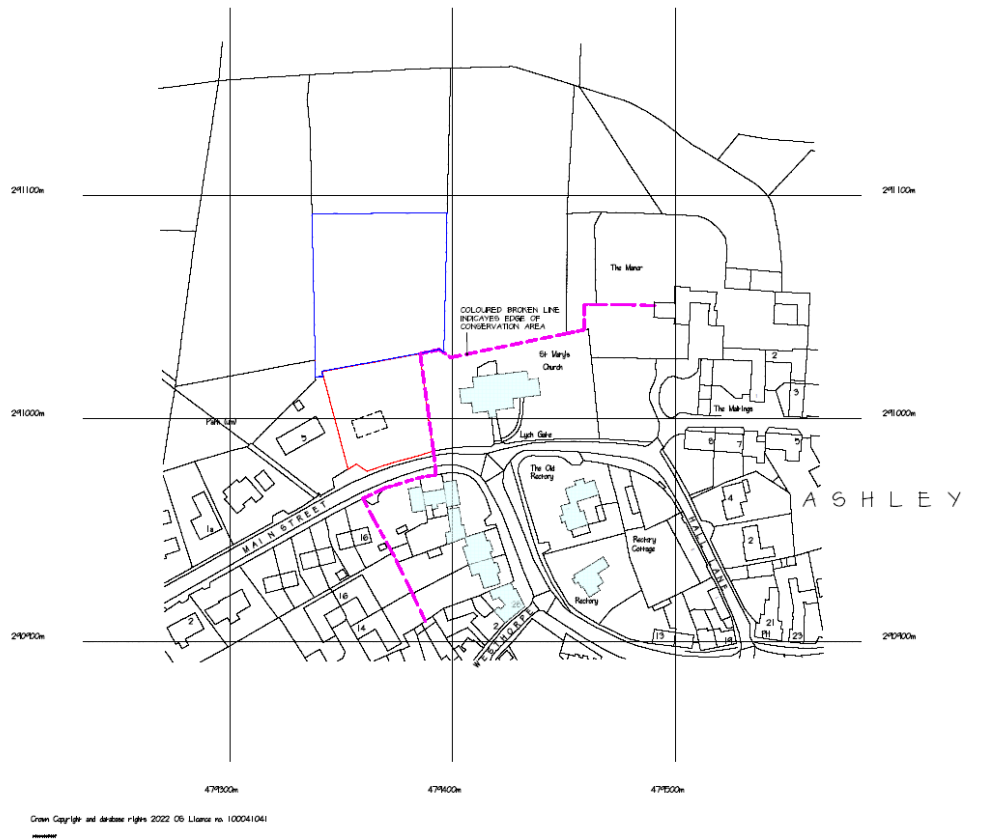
Detailed location plan showing site location highlighted red and proposals (bottom) (provided by client)
